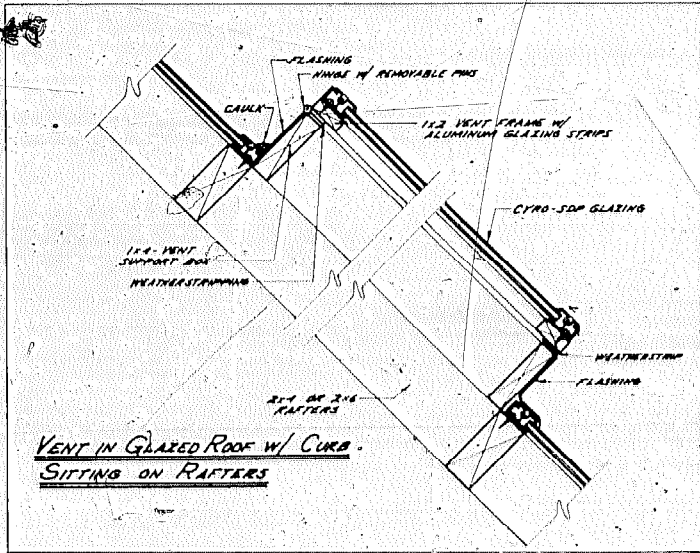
A Vent in glazed roof with curb sitting on rafters
